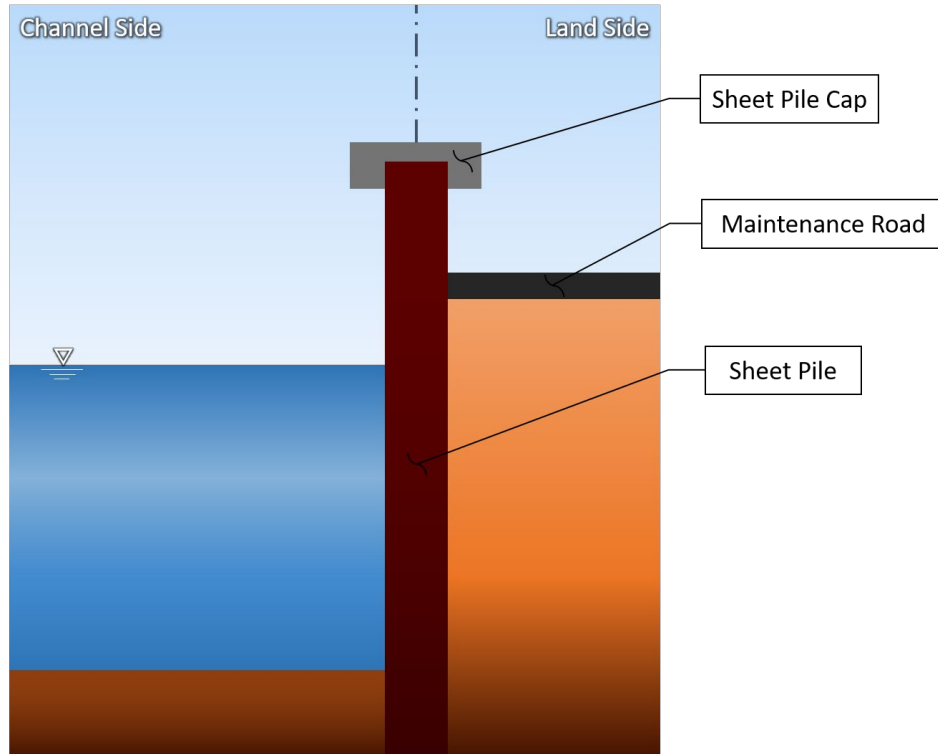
Typical Single-Wall Sheet Pile Section for Levee Reinforcement Projects
